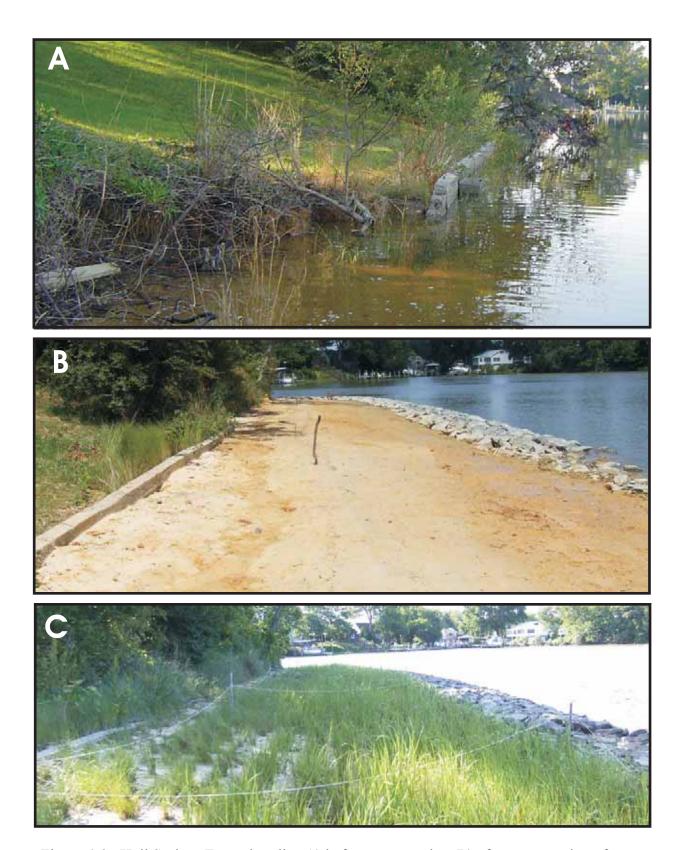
Hull Springs Farm shoreline A) before construction, B) after construction of the sill and placement of sand, and C) after planting.
